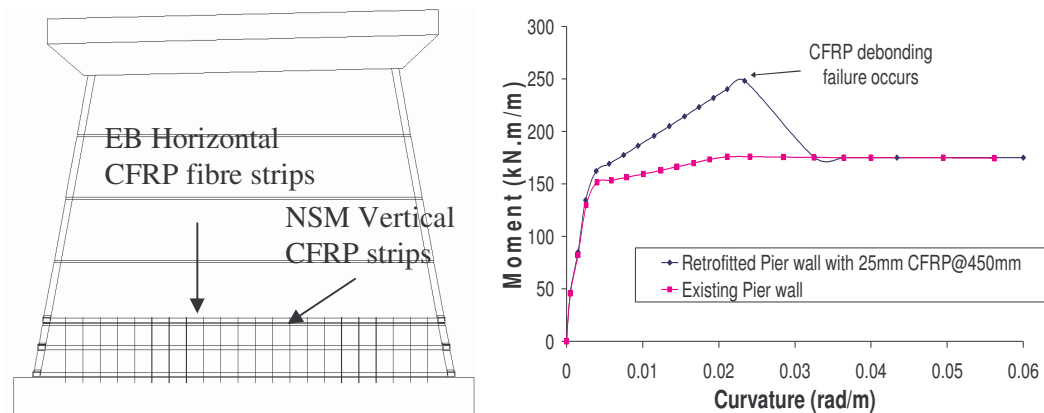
Layout of NSM CFRP retrofitting pier wall No. 8 Figure 7 Moment-curvature relationship for the retrofitted pier wall
